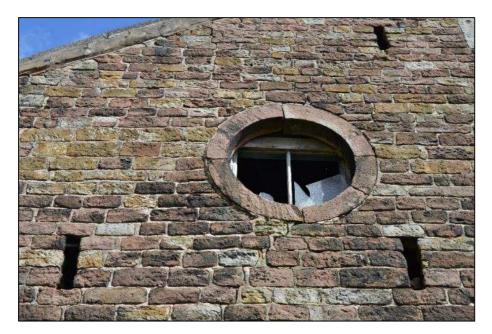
(Shot 9): Detail of south elevation of barn (Building 1), showing west circular pitching hole and breather slits, looking north
